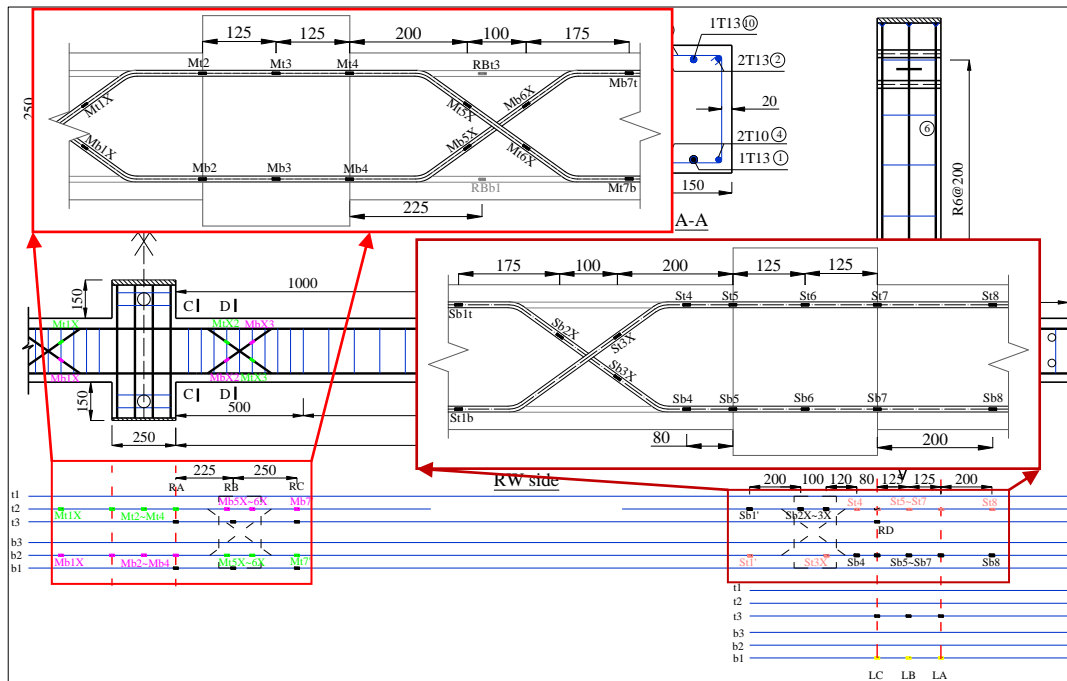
Arrangement of strain gages of specimen F7-SD-PH (unit: mm)
